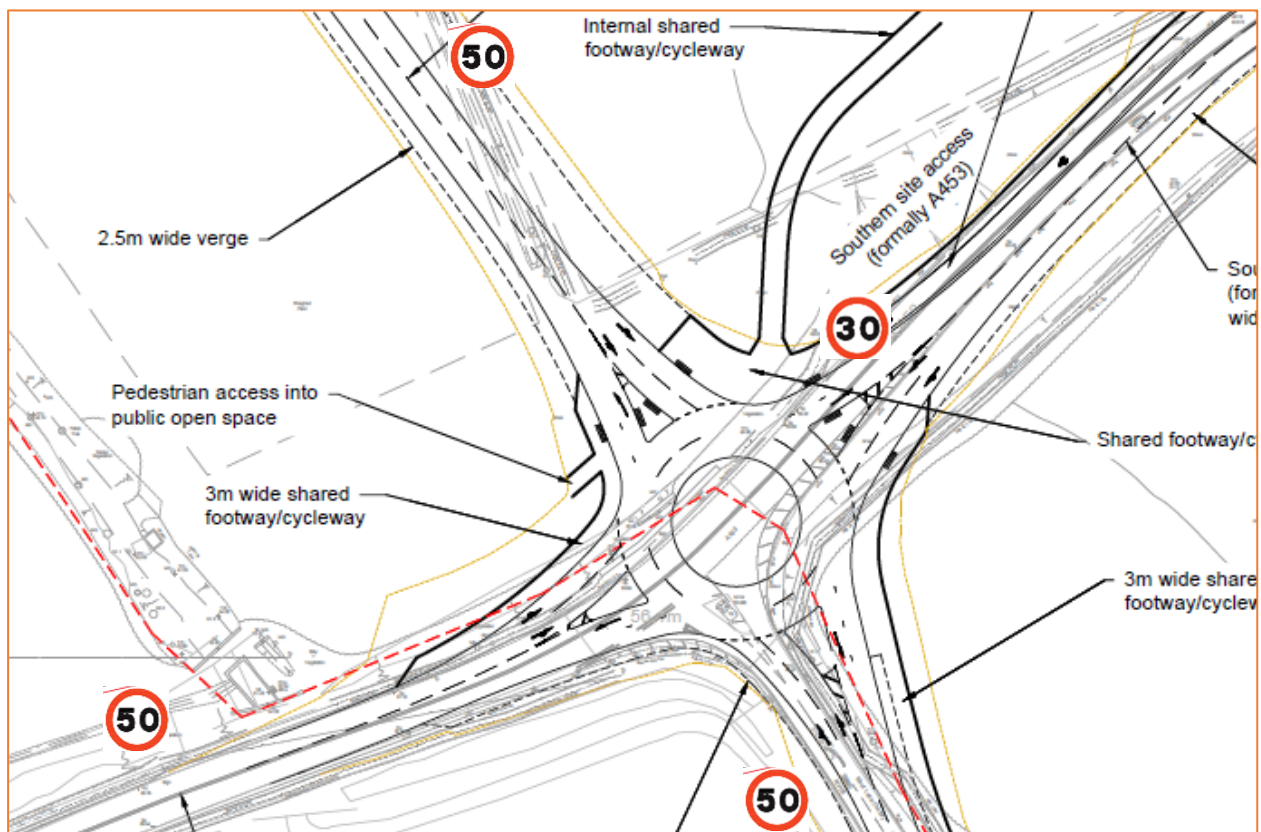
extract of drawing ADC2570-DR-002-P5
